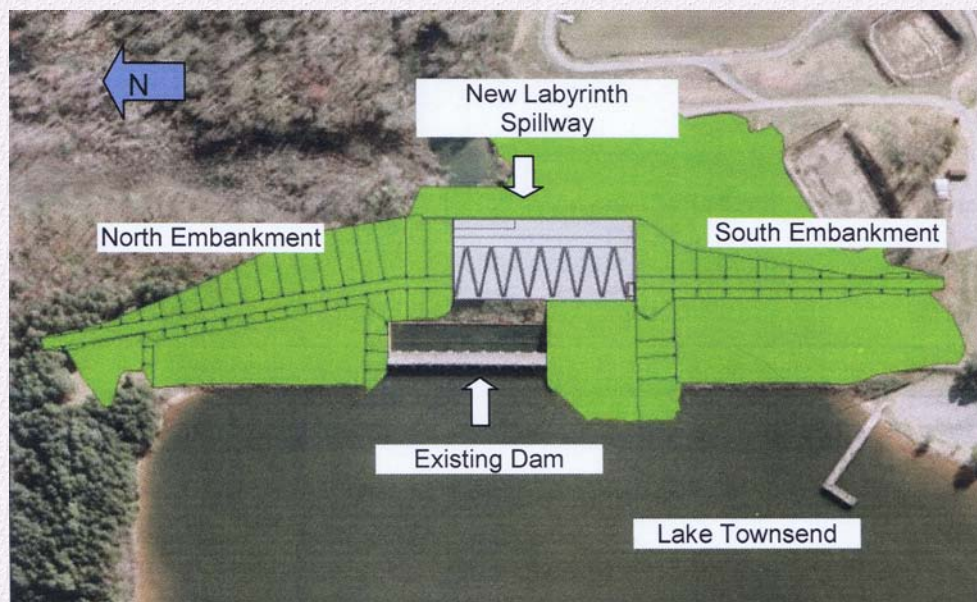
Layout of new dam and labyrinth spillway. Once the new dam is completed, the existing spillway and excess embankment will be removed.
